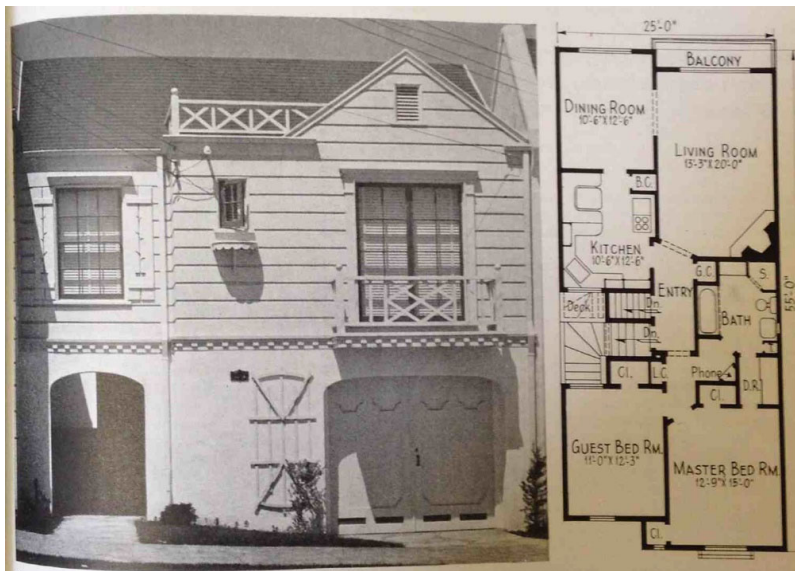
A “typical Doelger row house” elevation and plan with “patio entrance” at left. Source: “A City of Homes by One Builder,” *American Builder*, November 1941.
